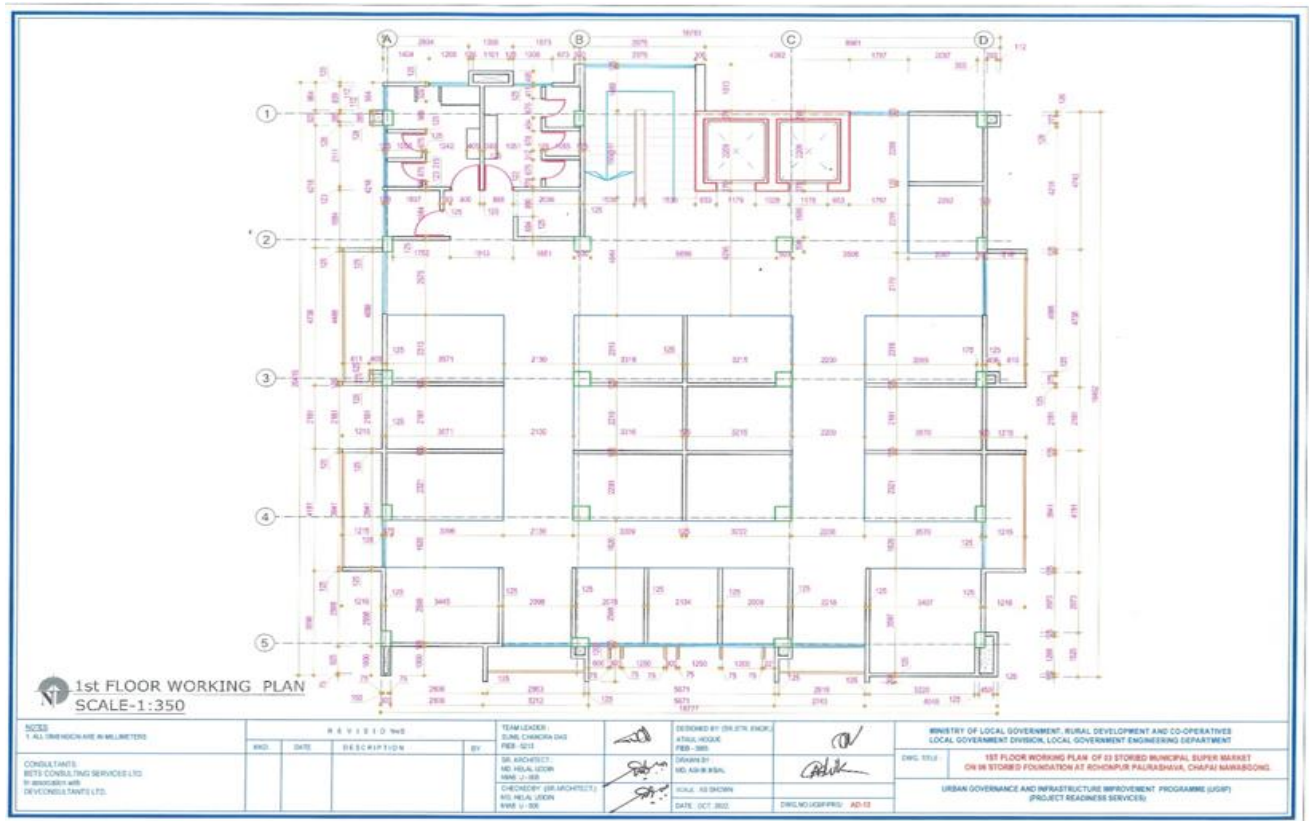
1st Floor Plan of Proposed Municipal Super Market
